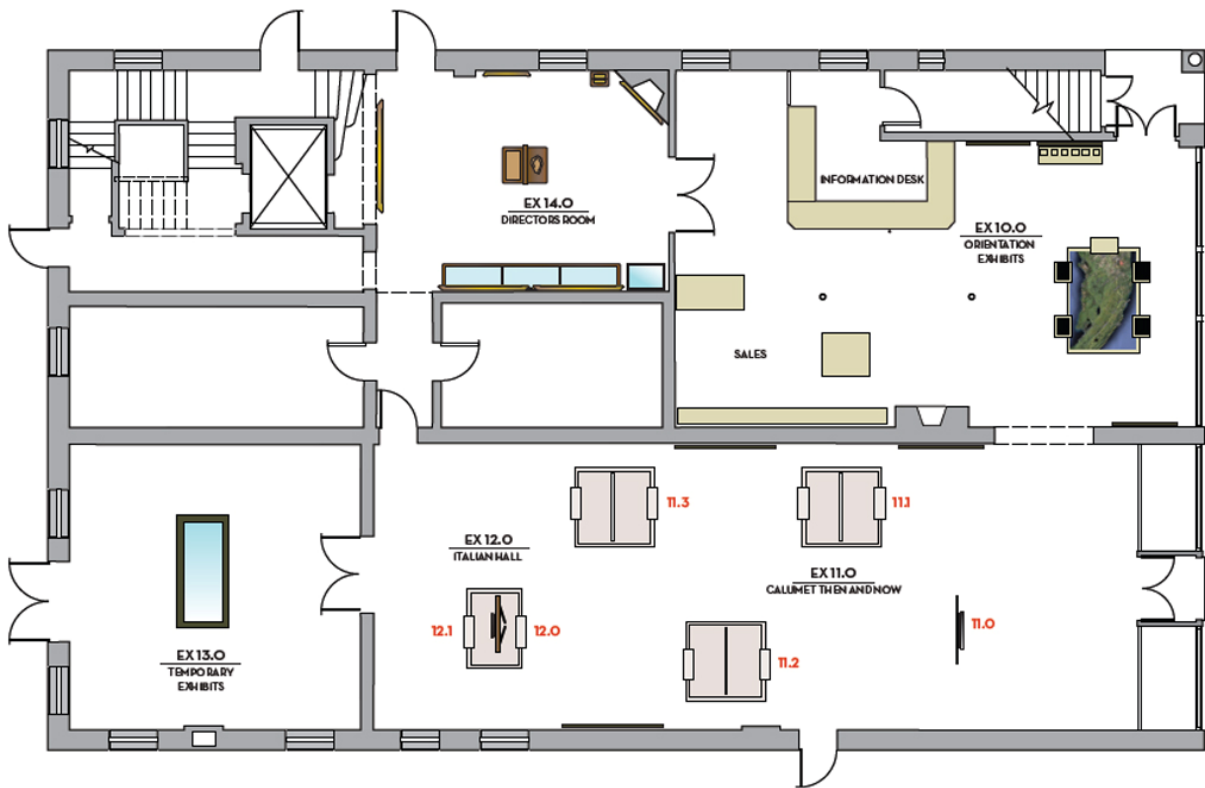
Exhibit Plan, First Floor of Union Building, Alternative 2 (Office of Krister Olmon)
